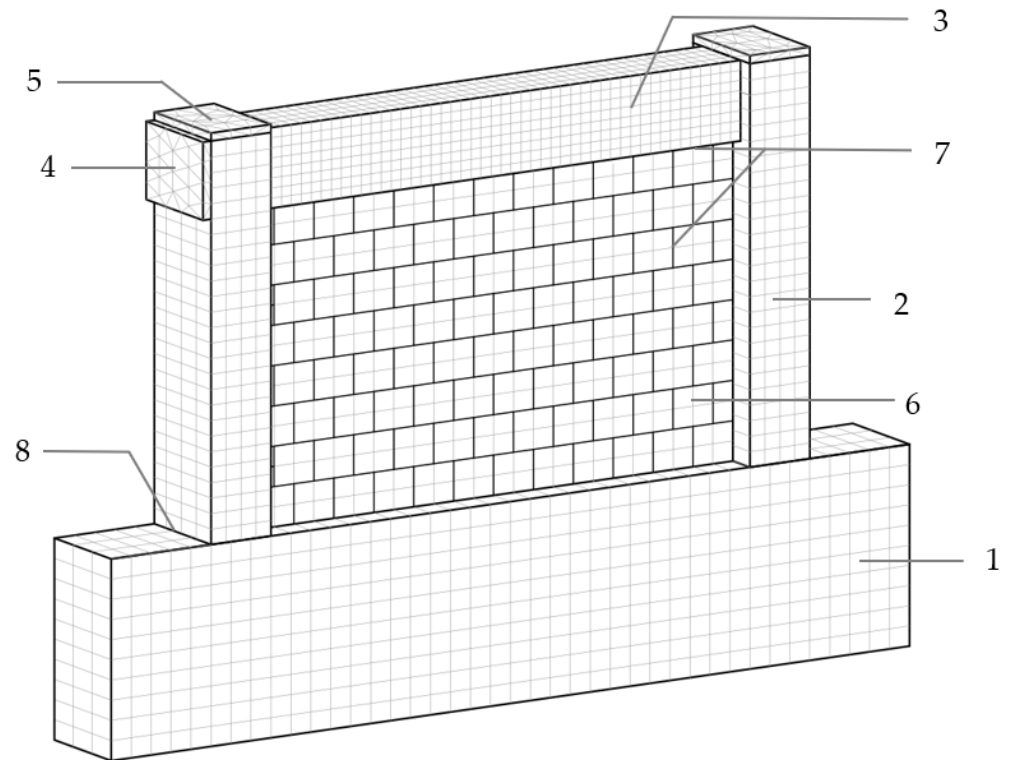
Construction details of the infilled frame specimen used in Kakaletsis experimental test.
